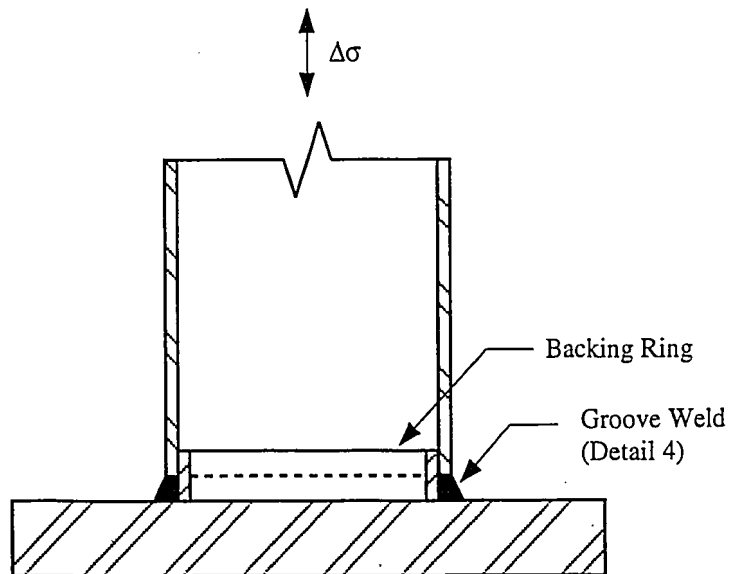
Groove-Welded Tube-to-Transverse Plate Connection.
